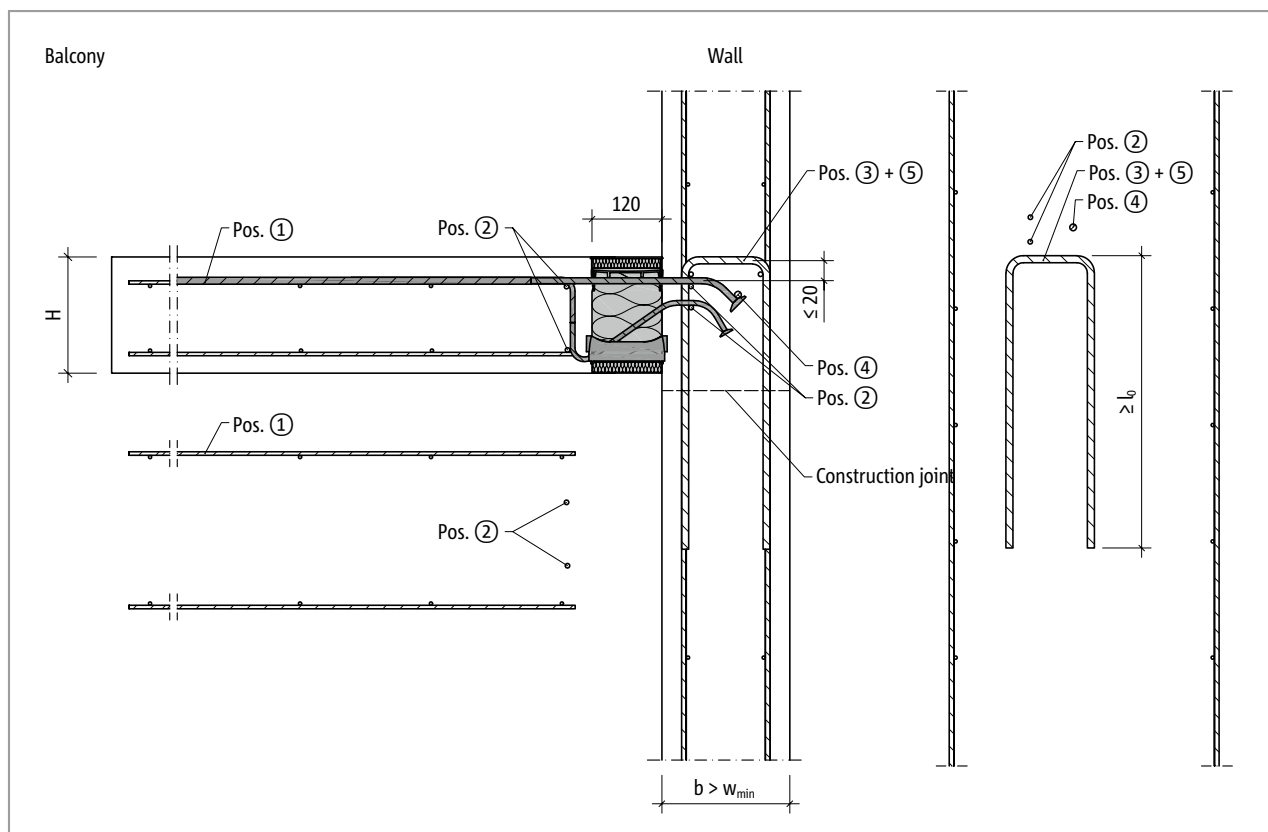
Schöck Isokorb® XT type K-O: On-site reinforcement for wall connection with larger structural element dimension ( $w_{vorh} > w_{min}$ )
